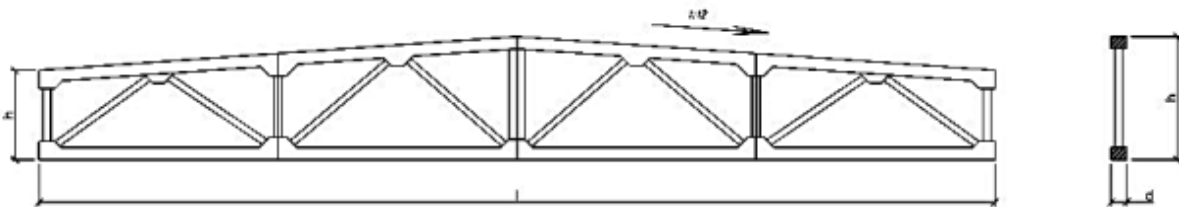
Composite double-slope reinforced concrete truss consisting of two half-trusses with a pre-stressed bottom chord
